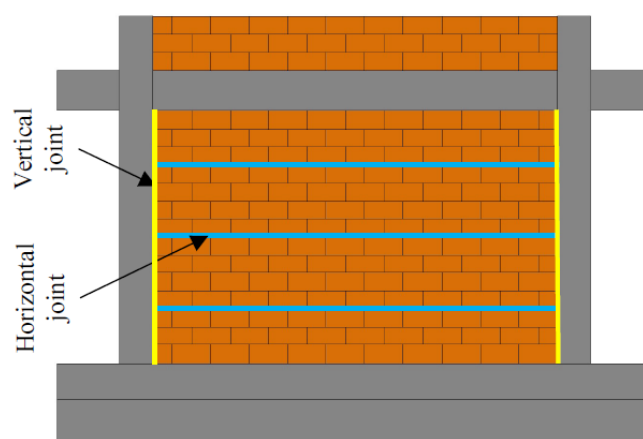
Masonry infilled walls with horizontal and vertical joints.
